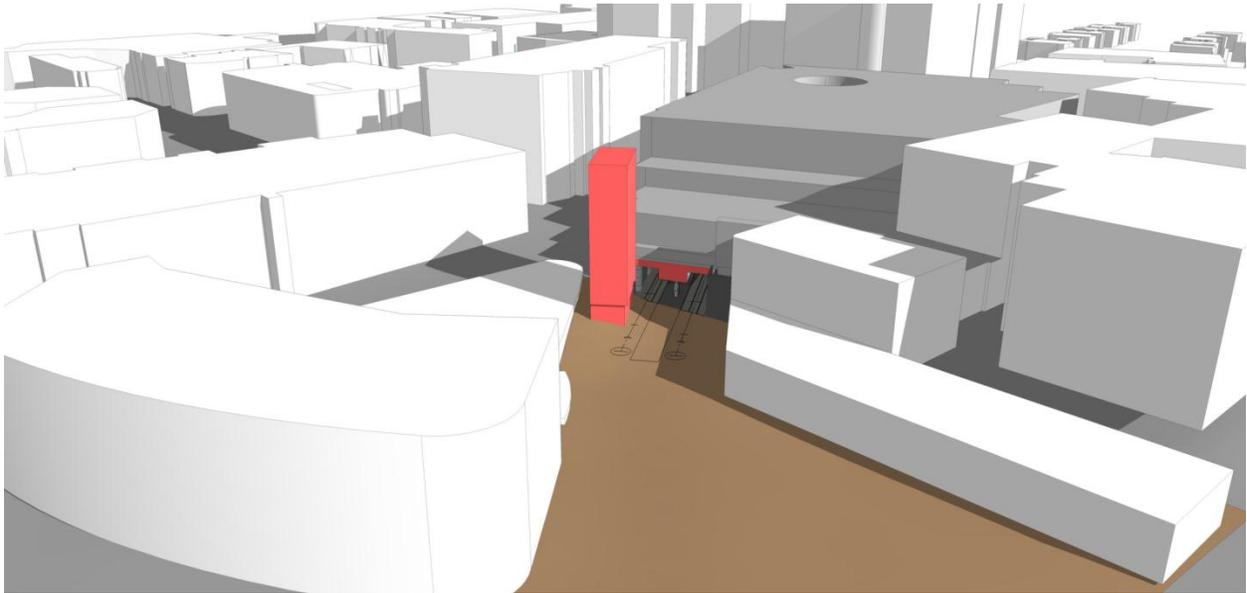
shows a plan view of the proposed fan house location. Exhibit 4 and Exhibit 5 show renderings of the fan house in Woodmont Plaza with existing building heights and approved building heights, respectively.
